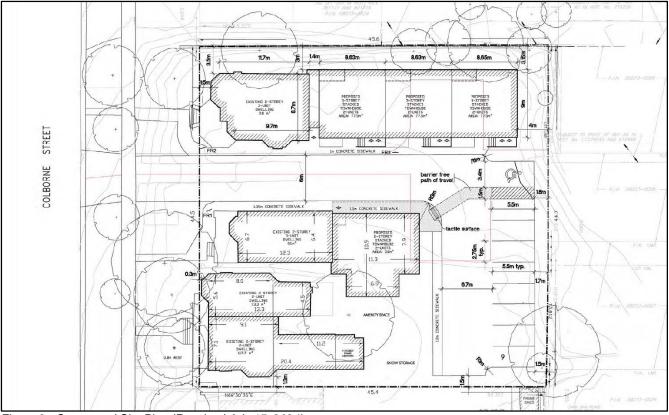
Conceptual Site Plan (Received July 15, 2024)
